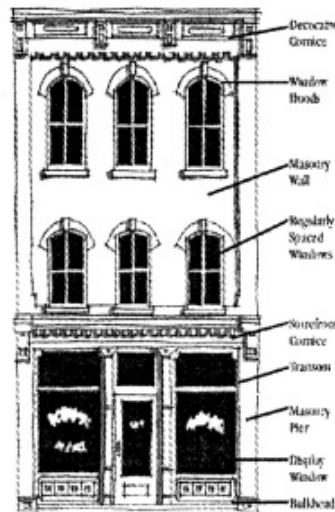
C: EXAMPLE OF STOREFRONT WITH WINDOWS AND DOORS ALONG STREET FRONTAGE
